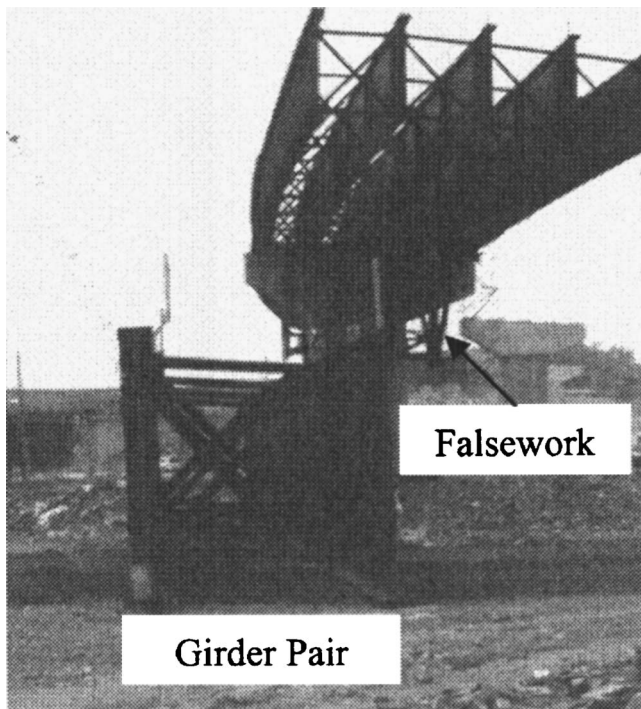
Girder framing and preassembled girder pair, Structure No. 7
